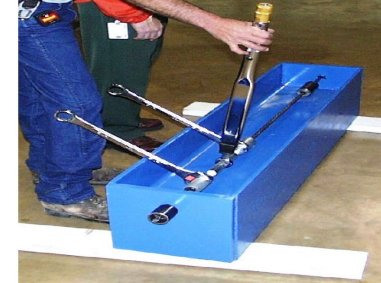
Strand splicing, mock-up to test the splices before installation, Baishya et al., 2010
